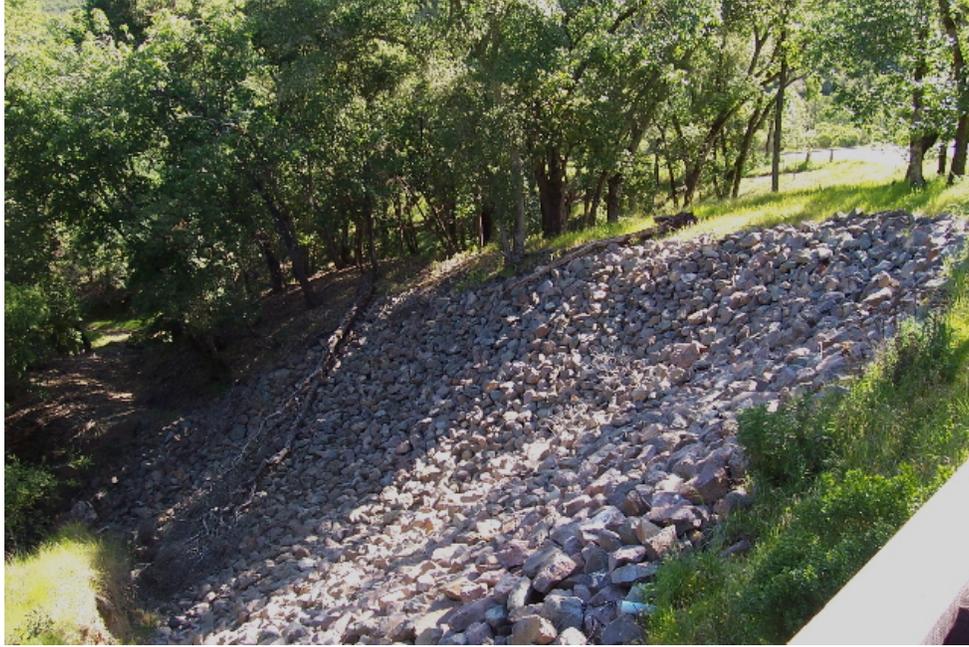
Slope stability enhancement on access road to Blue Oaks subdivision.
